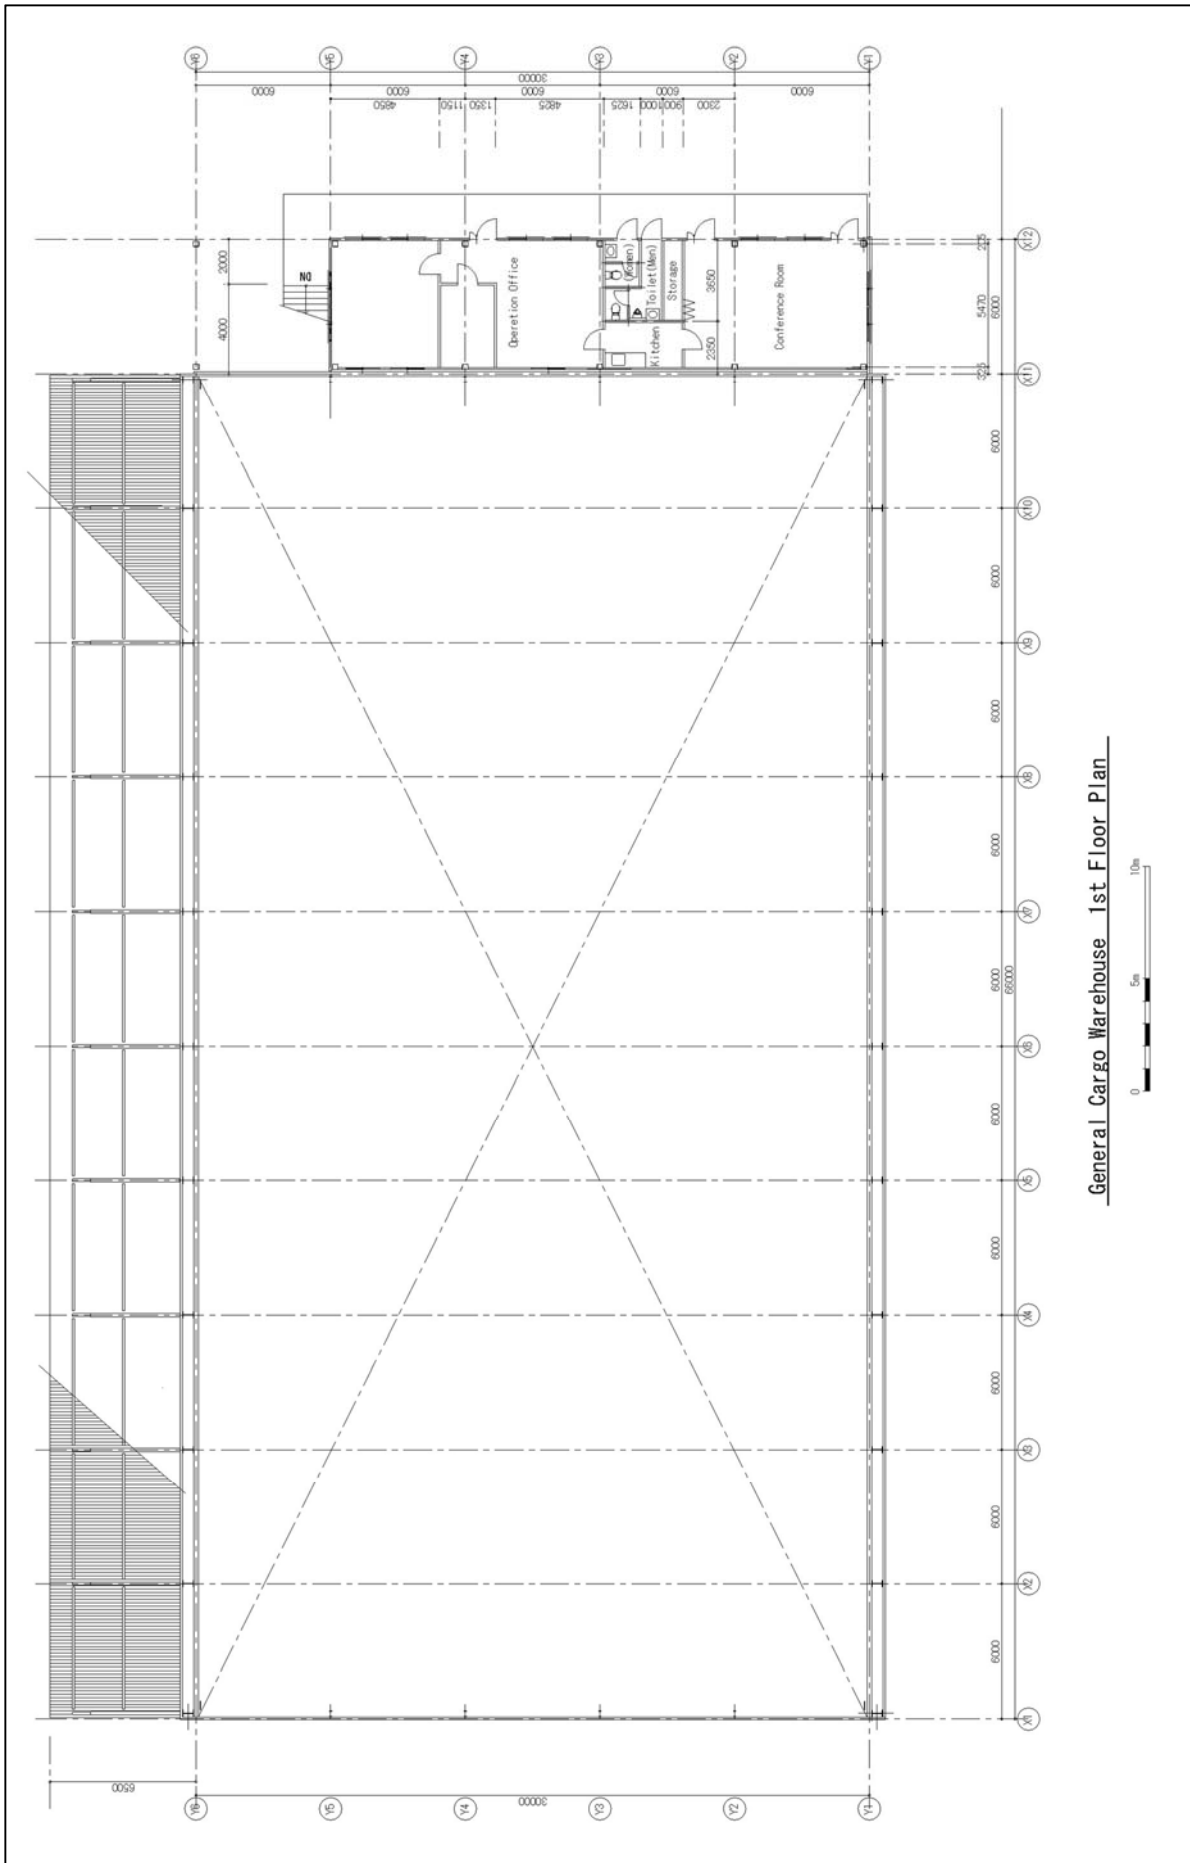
Layout Plan of (New) General Cargo Warehouse (1F)
